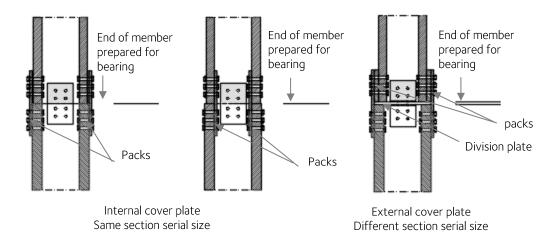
Examples of connections by contact – bearing splices for rolled sections.
